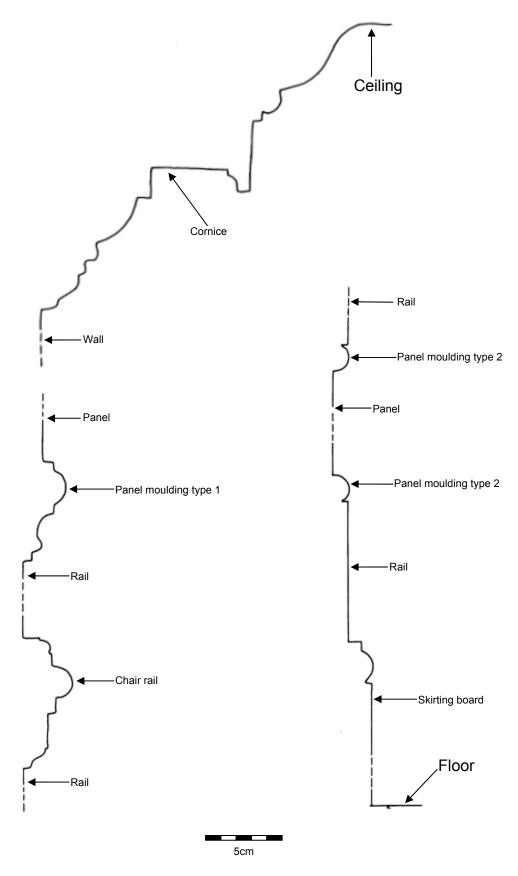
Room 3, north wall: skirting and lower panel (moulding type 2) (right), chair rail, part of middle panel (moulding type 1) and cornice (left).
